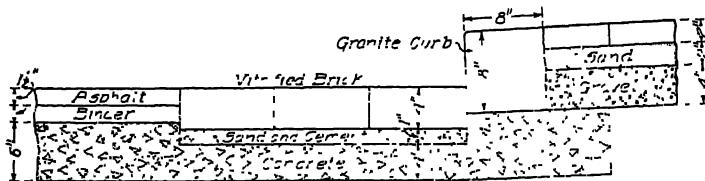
Section of Asphalt Pavement Showing Use of Vitrified Brick to Form Gutter
